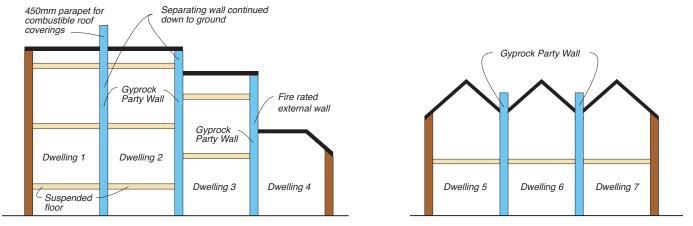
Typical Gyprock Party Wall Applications For Class 1 Buildings
